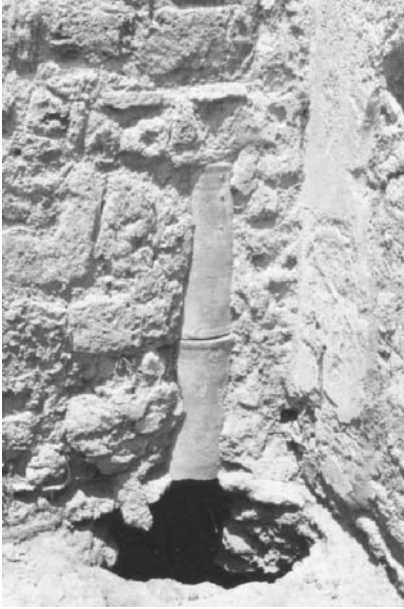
Downspout tile made of terracotta pipe draining to a cistern under a house in Pompeii. (Photo by Larry W. Mays and copyright by Larry W. Mays)
